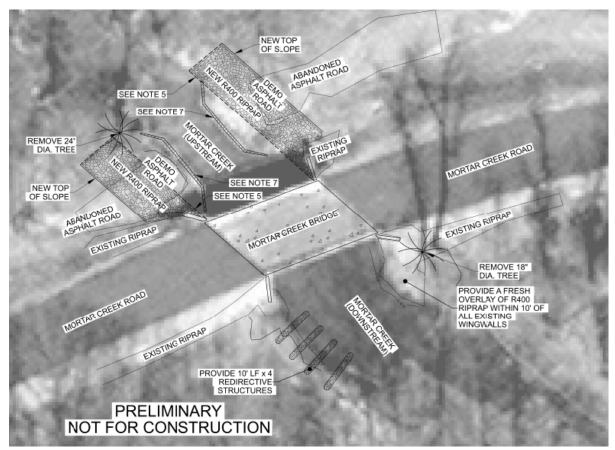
Alternative 3 - Protect Bank and Remove Bridge Abutments
